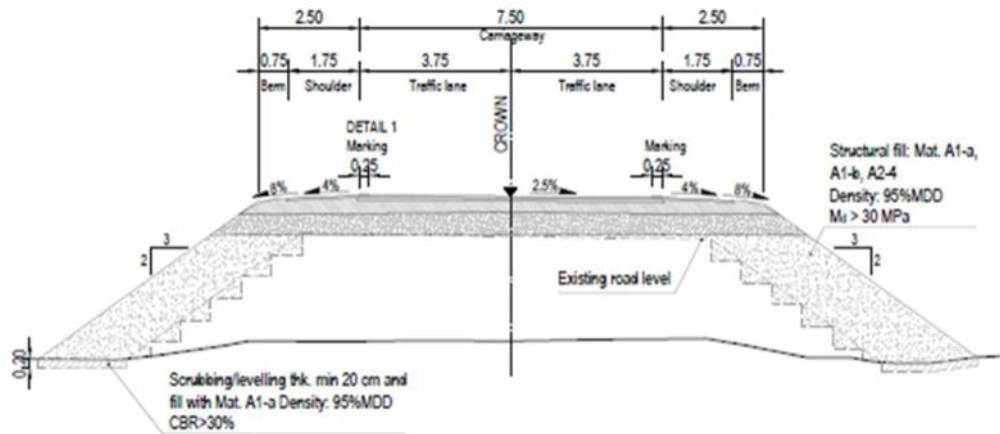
Typical cross-section selected for the project section outside urbains zone - (APS technical study)
